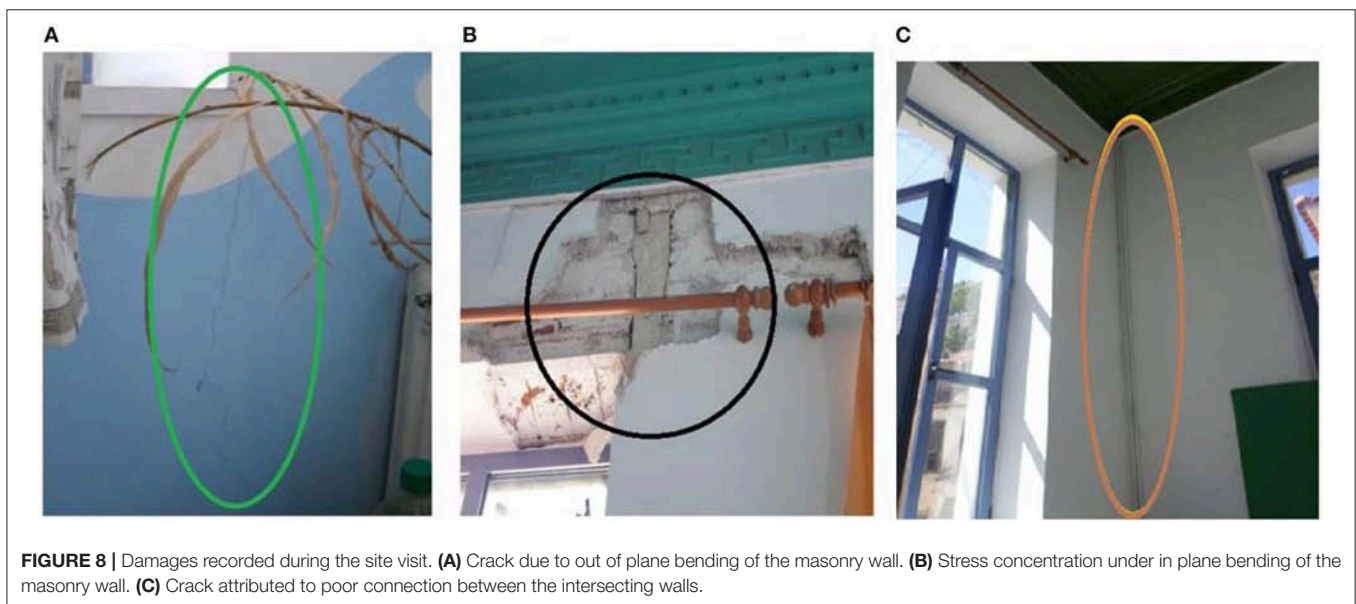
| Damages recorded during the site visit. (A) Crack due to out of plane bending of the masonry wall. (B) Stress concentration under in plane bending of the masonry wall. (C) Crack attributed to poor connection between the intersecting walls.
